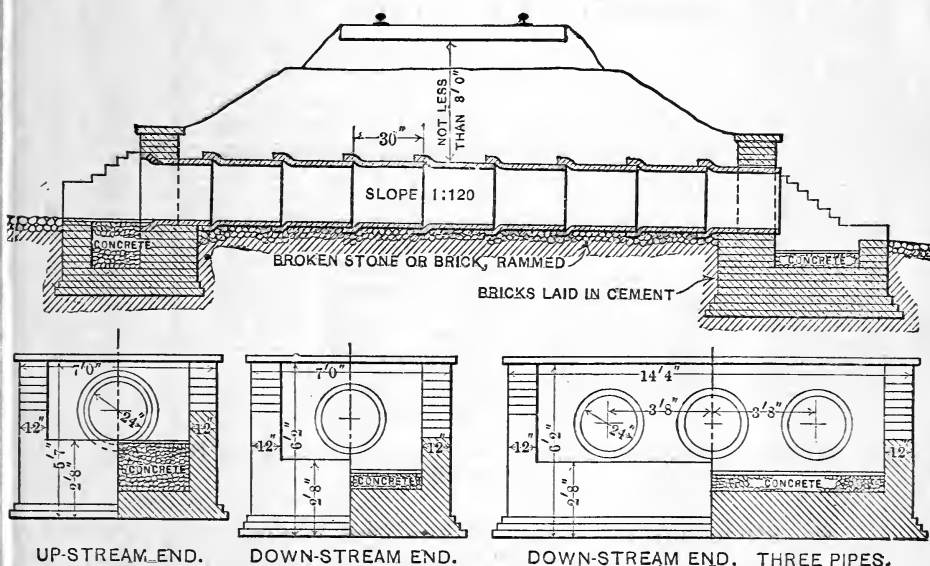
STANDARD VITRIFIED-PIPE CULVERT. PLANT SYSTEM. (1891.)
